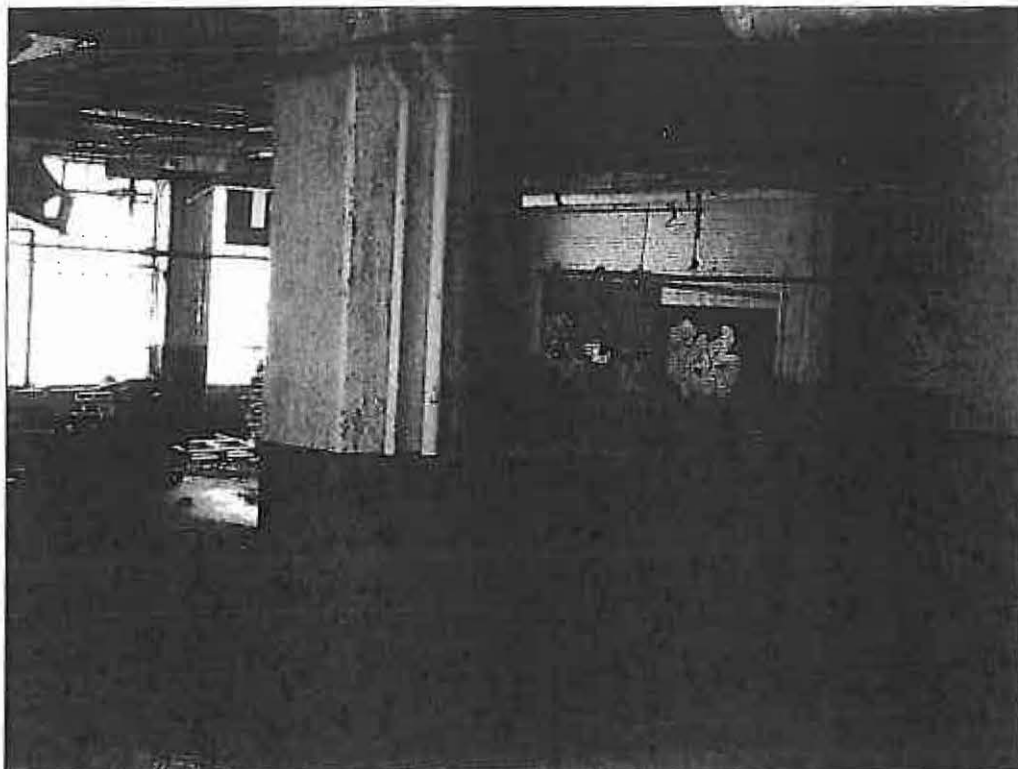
Interior of Building No. 7 showing piping (AOC A-3) and debris located throughout 1st floor.
